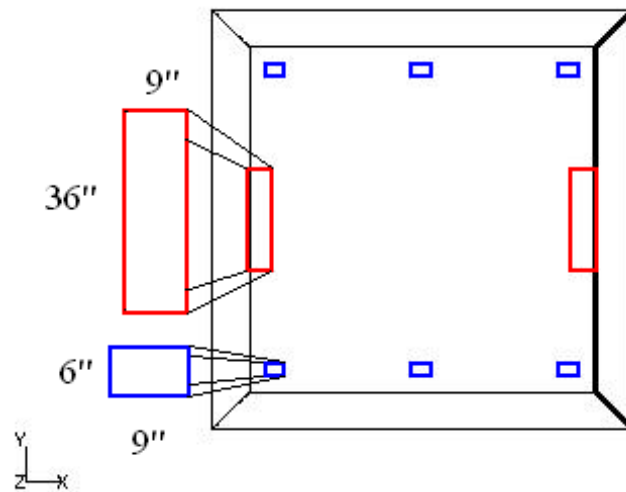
Case 3 – Plan View of Six Inlet Vents on the Floor and Two Outlet Vents on the Ceiling and their Sizes and Placements
